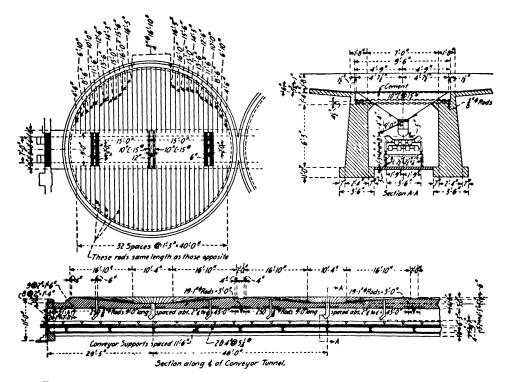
DETAILS OF BIN BOTTOMS AND CONVEYORS UNDER BINS, INDEPENDENT ELEVATOR.
